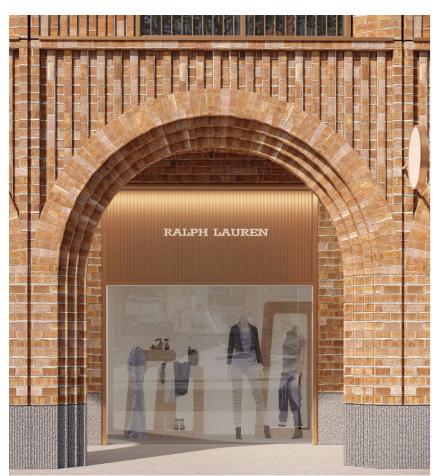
View 1 - Illustrative visual of facade detail study to KCS Building
